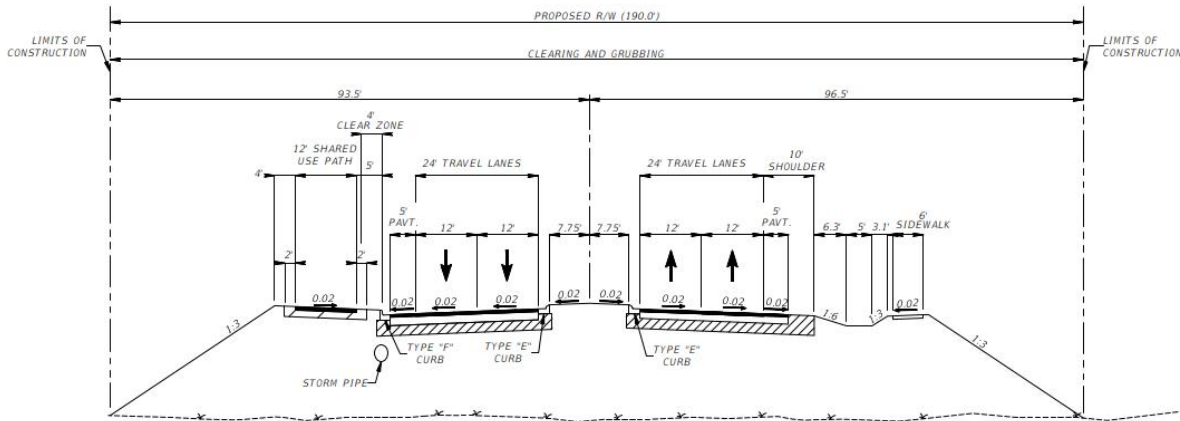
Build Alternative Typical Section, Alf Coleman Road Extension
